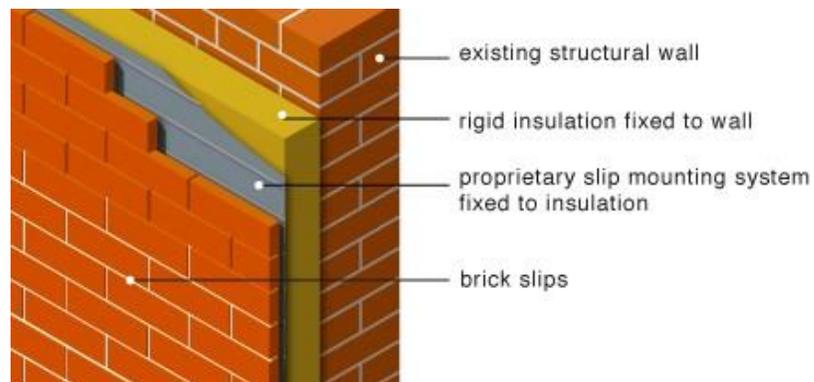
Cavity wall insulation (Source: www.greenspec.co.uk building design).
